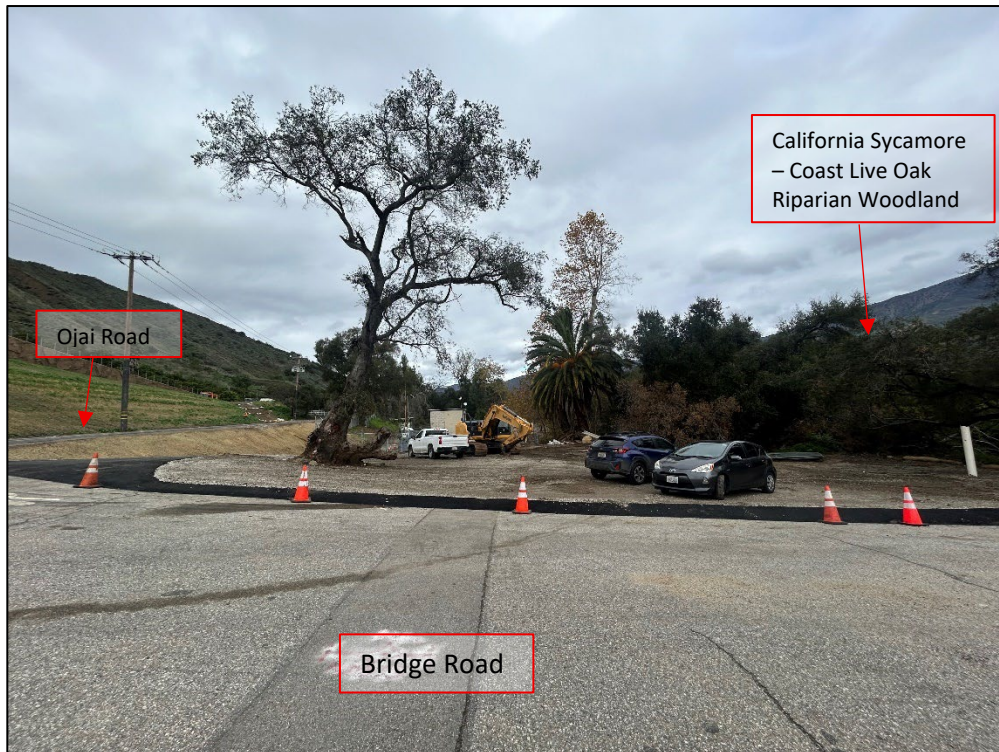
Area west of Santa Paula Creek along Bridge Road, bordered by California Sycamore – Coast Live Oak Riparian Woodland adjacent to the creek; view facing northwest. (January 2, 2026)
